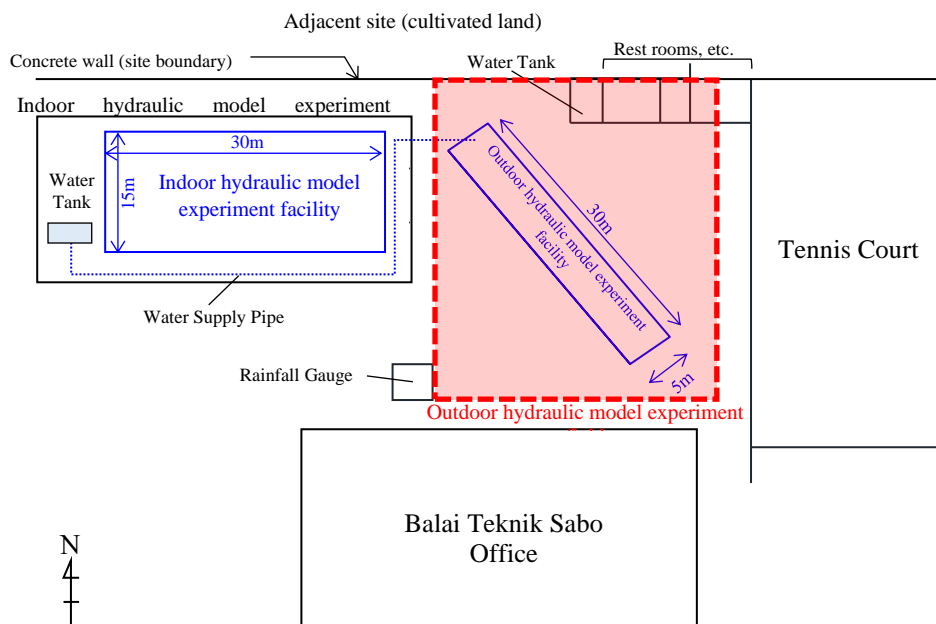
Current layout of facilities around the outdoor hydraulic model experiment field
